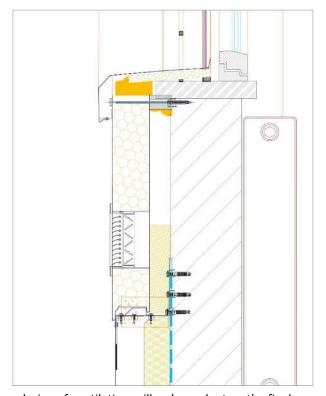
Preliminary design of ventilation grilles dependent on the final manufactured façade panel.
